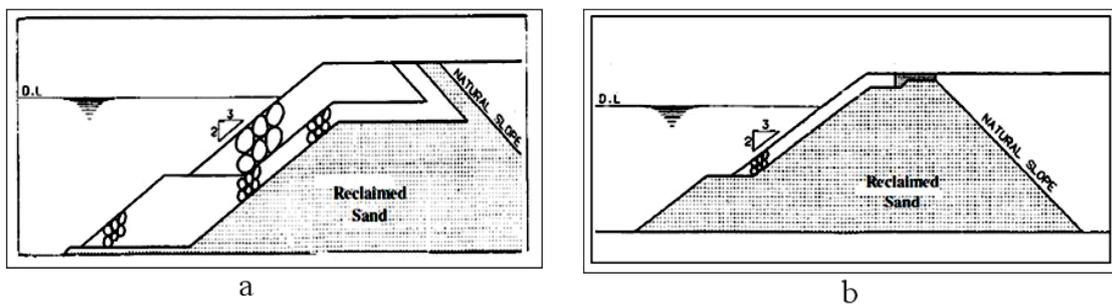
(a) and (b) are typical sea wall and light protection sections for dredged materials usage
